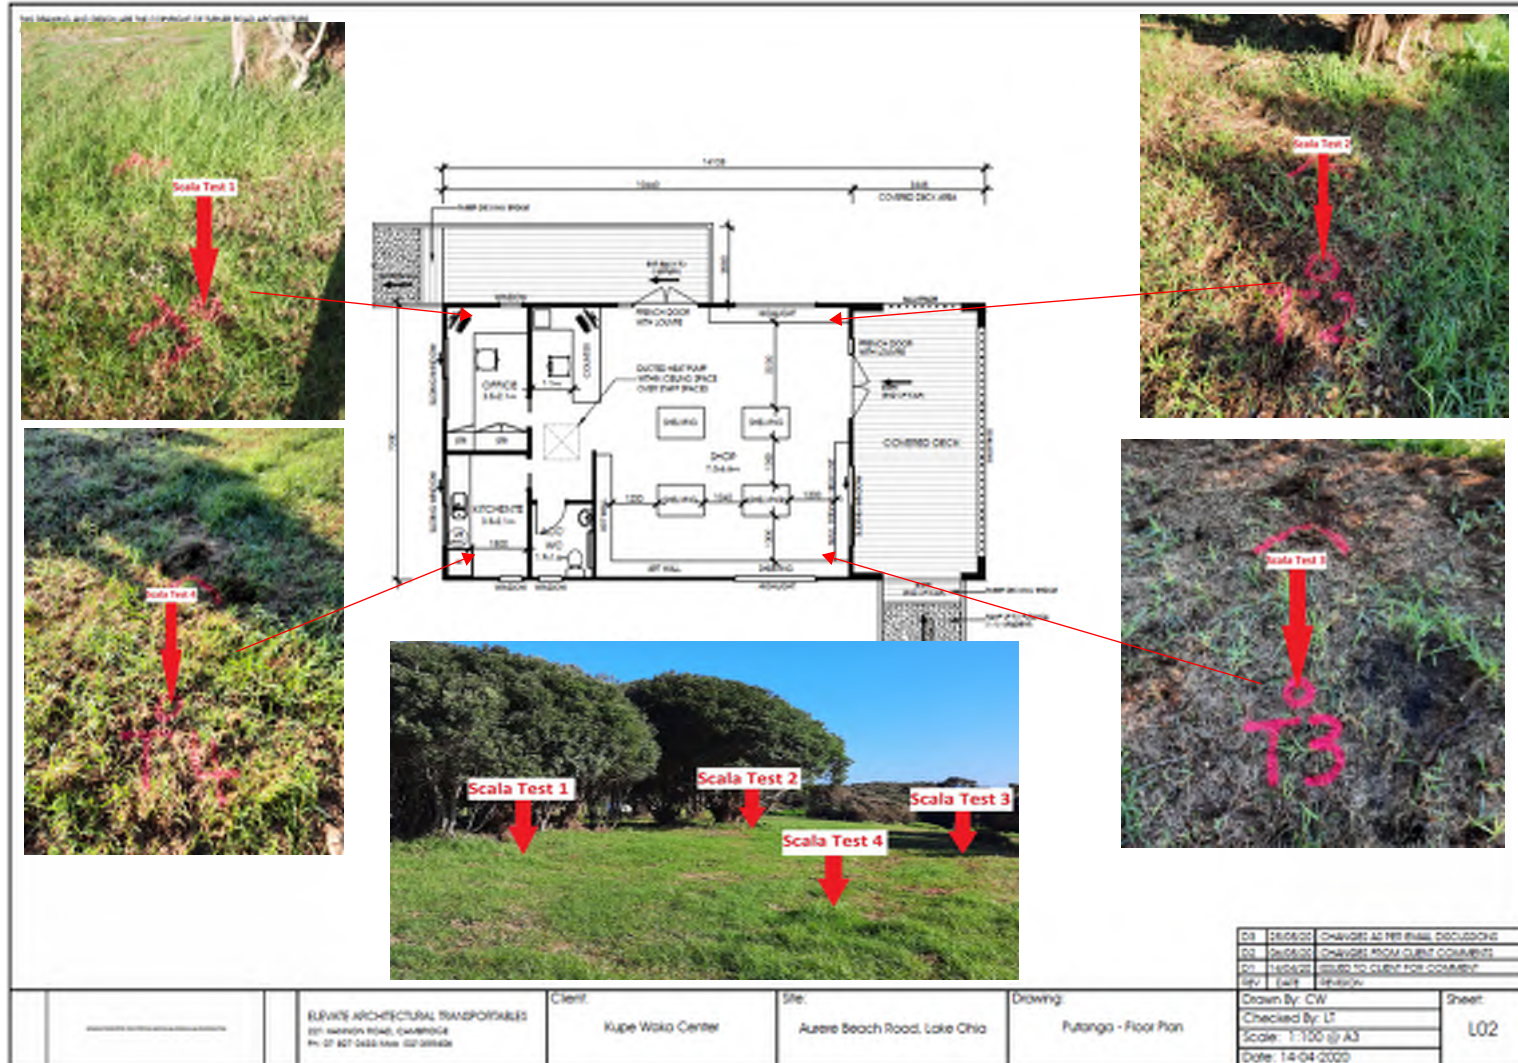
Floor plan of Putanga building with Scala Penetrometer test locations shown, with photos of test sites included.
